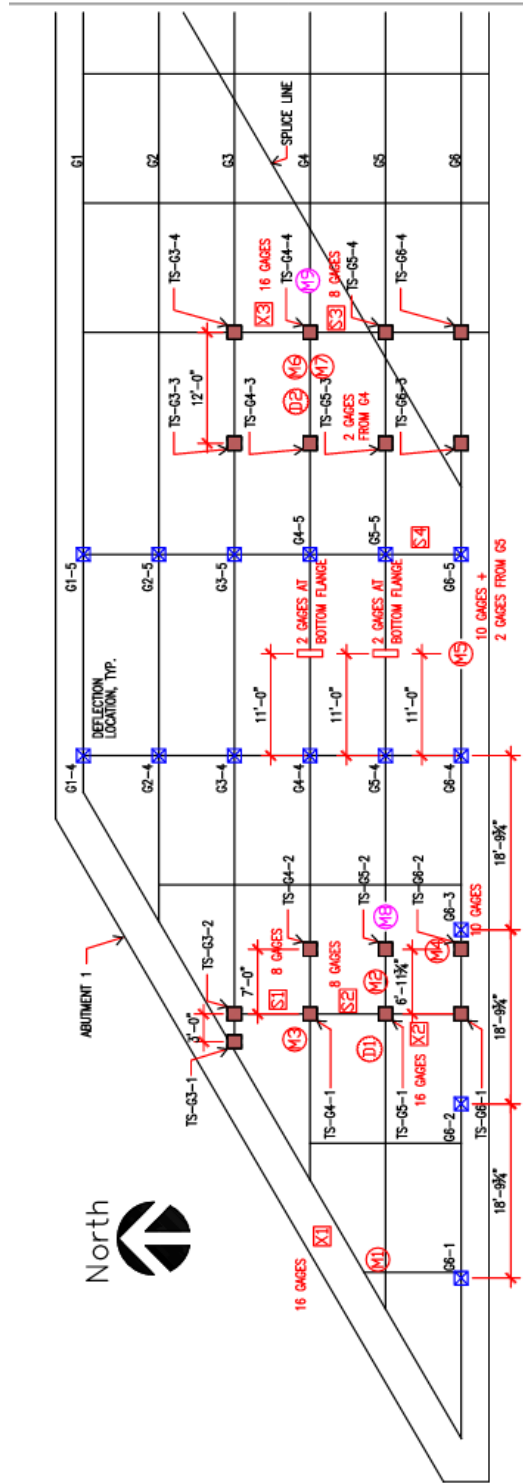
Instrumentation Plan for 19th Street Westbound Bridge
